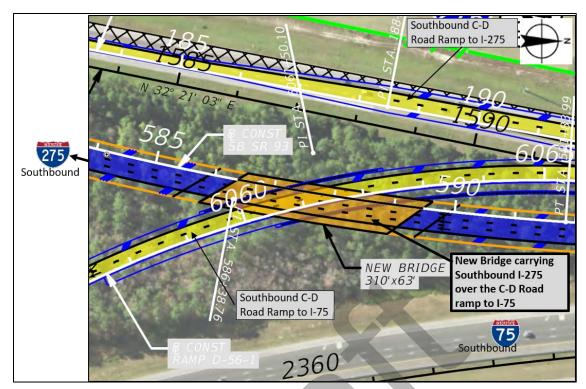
New Bridge-I-275 over C-D Road Ramp to I-75
